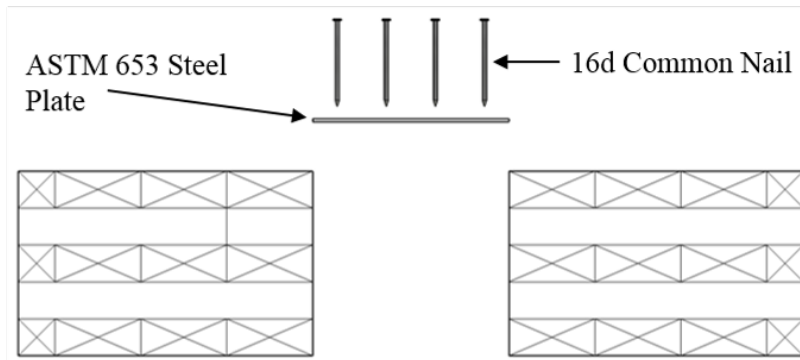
Surface Spline Assembly and Fastener Spacing
